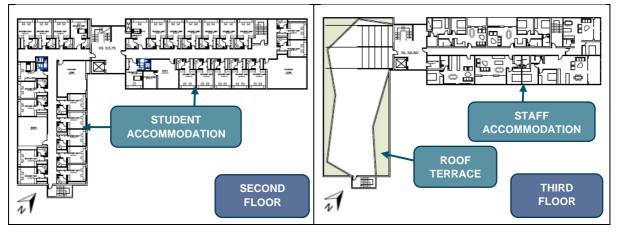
| Boarding accommodation - second and third floor plan (Source: Applicant's RtS 2020)
